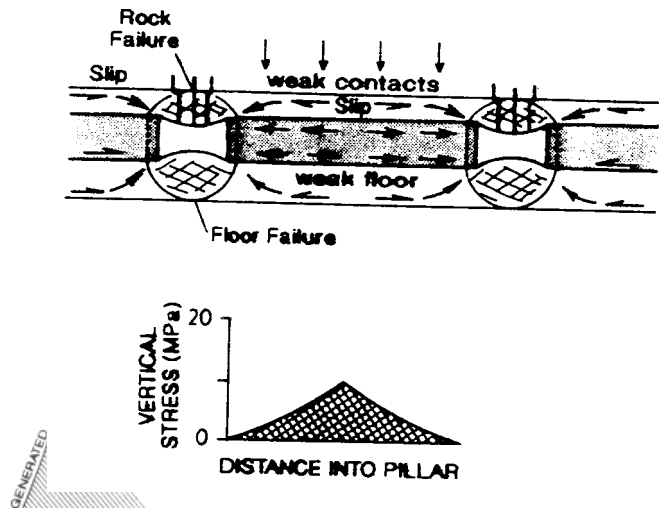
Low bearing capacity of coal pillar with weak (low shear strength) coal / rock interfaces. Note that horizontal slippage also causes roadway roof and floor failure, in addition to rib spall.
